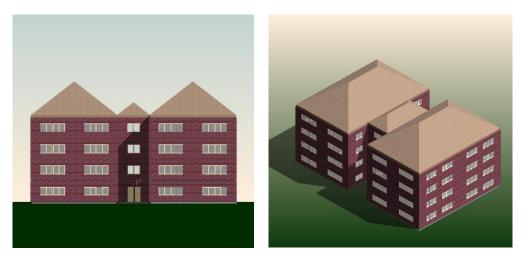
Front view (left), diagonal view (right) of the 4-storey building
